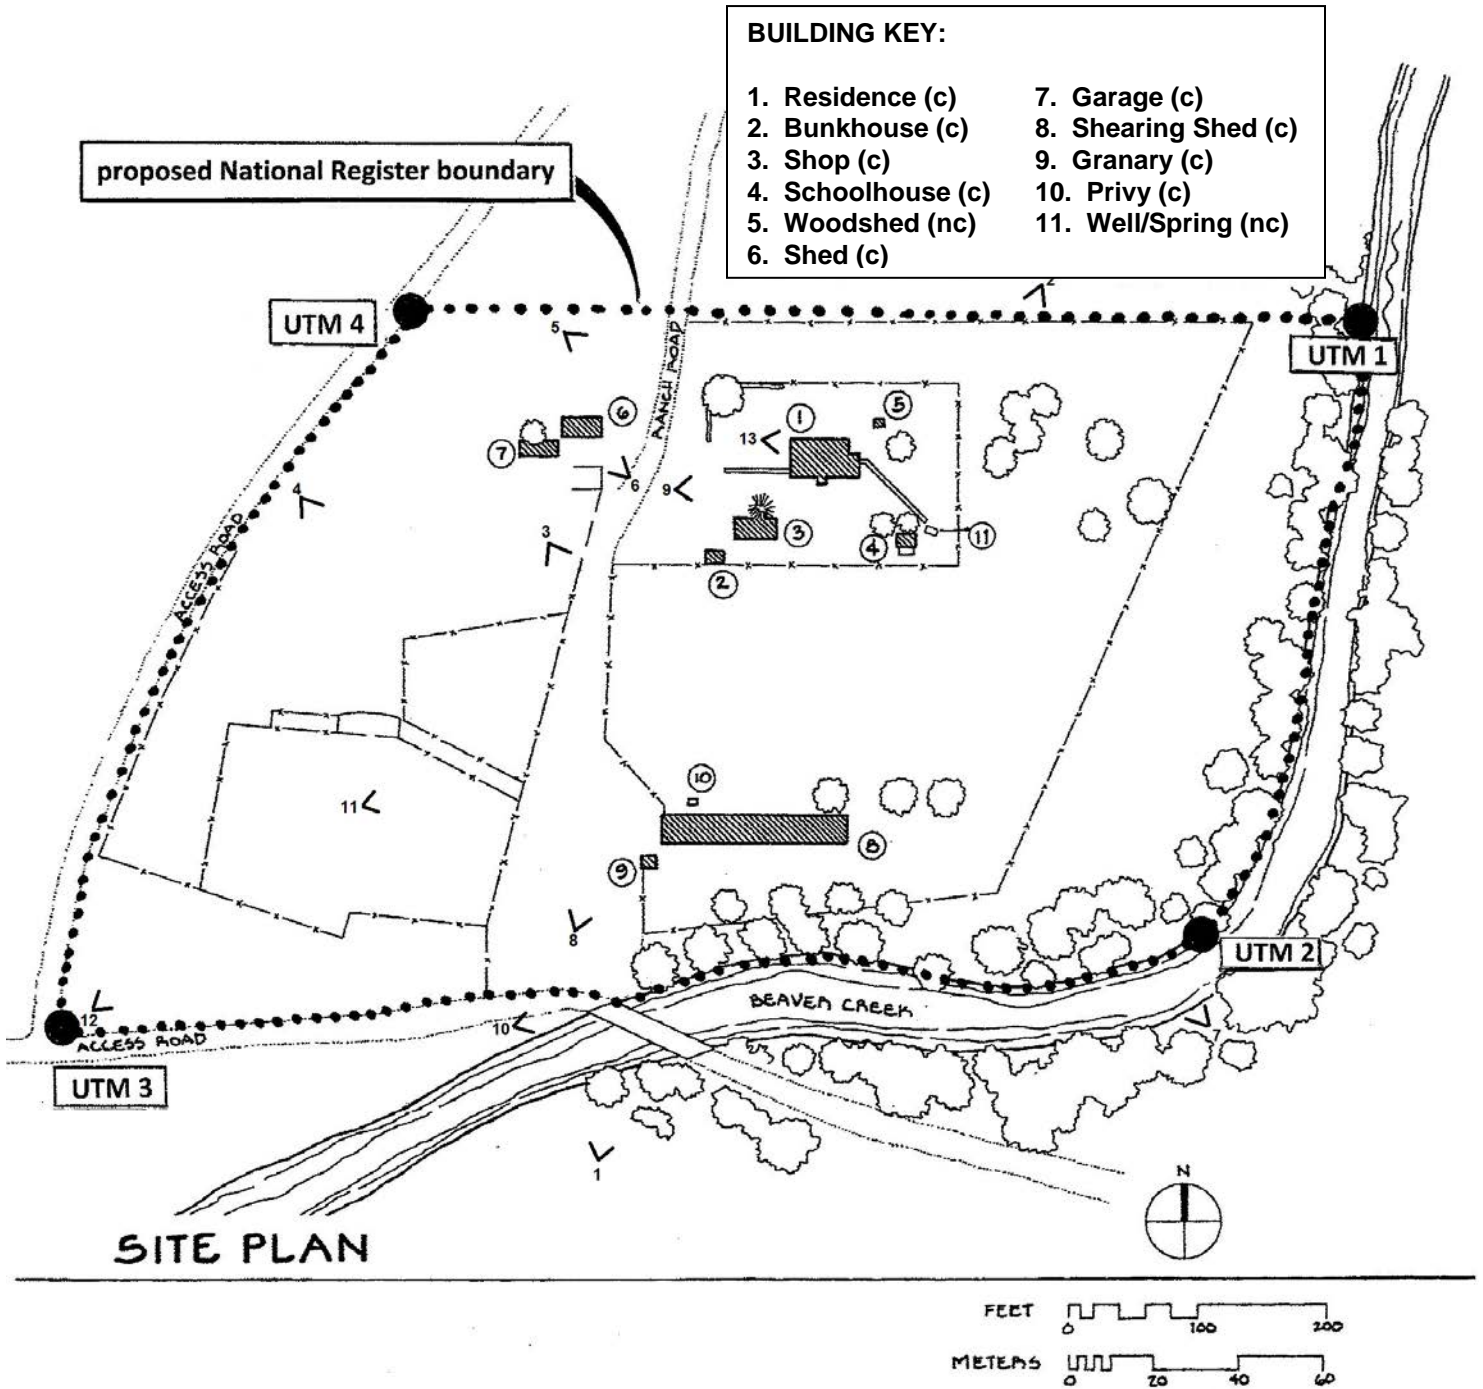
Beaver Creek Ranch, site plan showing boundary of historic site and ranch buildings.
